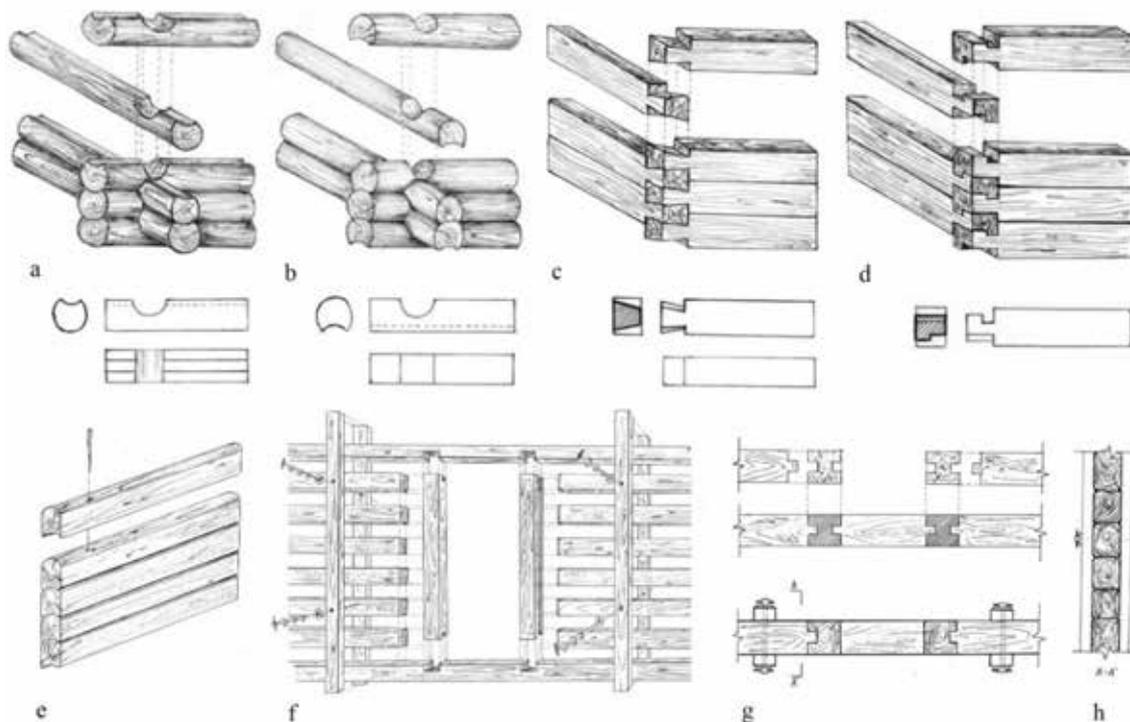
a-d) Blockbau constructive system; e) Log connected to the lower one by wooden nails; f, g, h) Secondary structure composed of pillars placed on the internal and external walls of the church in order to reinforce and stiffen the perimeter walls.
